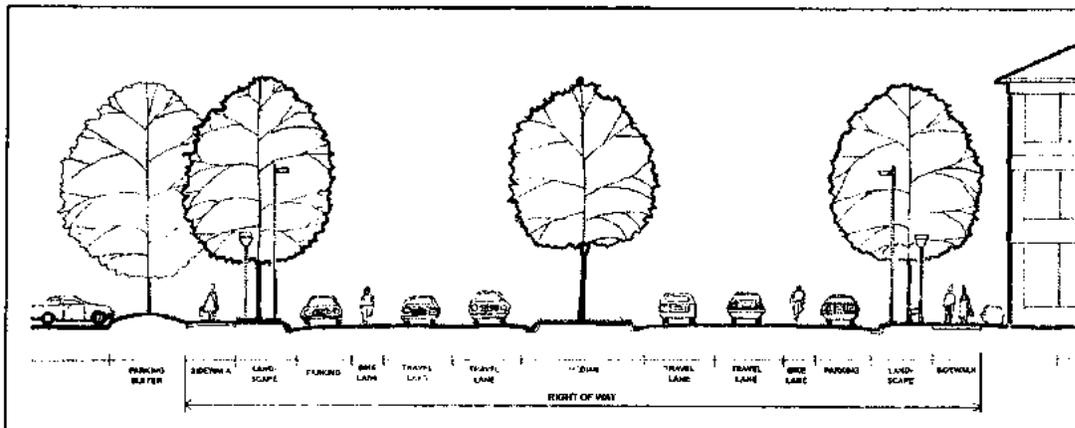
and 2, along with table 1, indicate the arrangement, location, and width of the required elements of street design within the overlay district. All streets except alleys shall be paved to county or city specifications. Right-of-way would be increased on state and federal routes or truck routes where twelve-foot-wide lanes are required.
